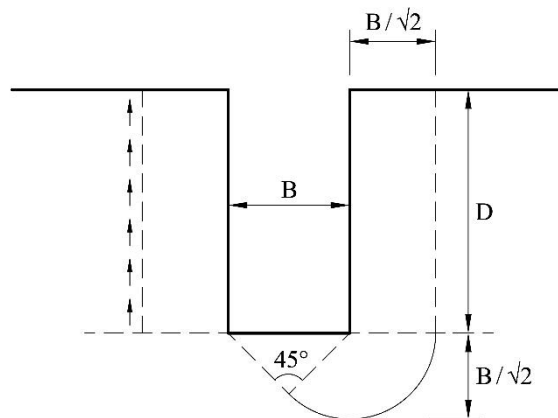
Failure mechanism of a 2D excavation in a clayey soil, according to Terzaghi (1943).
